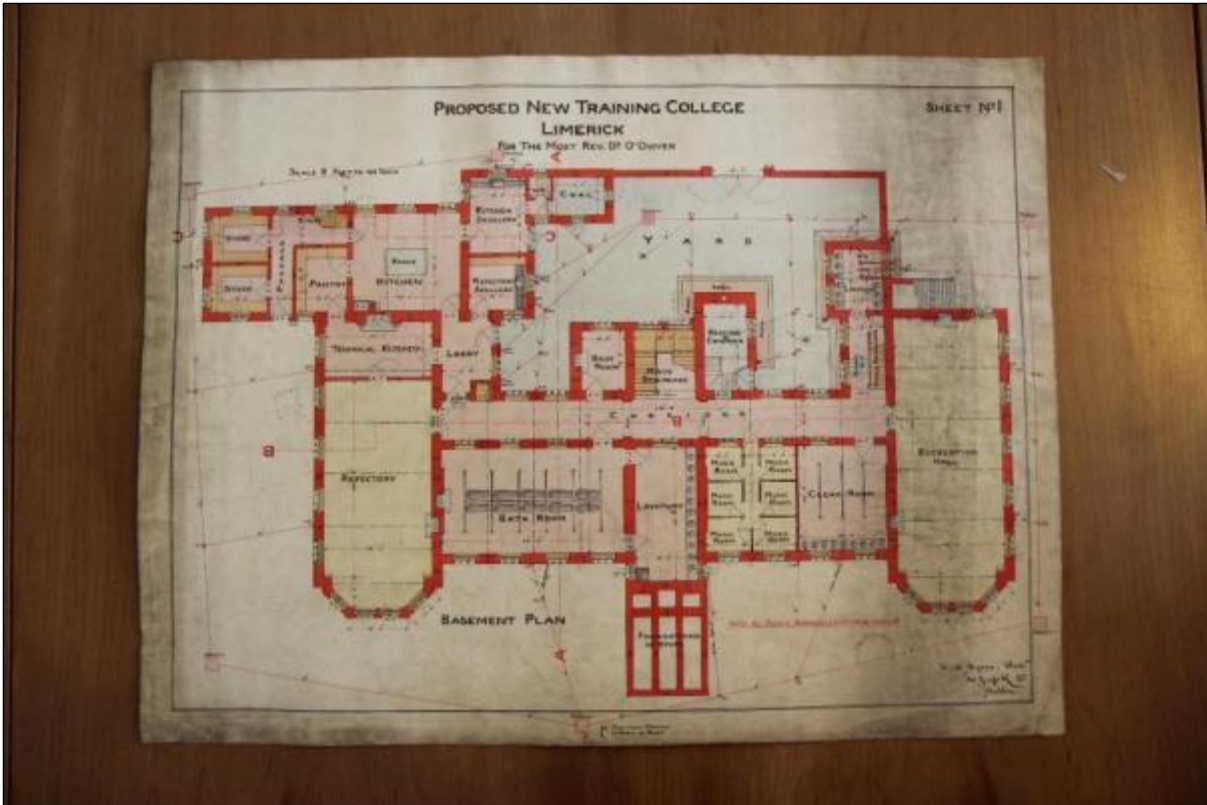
Mary Immaculate College Basement Plan - Irish Architectural Archive
